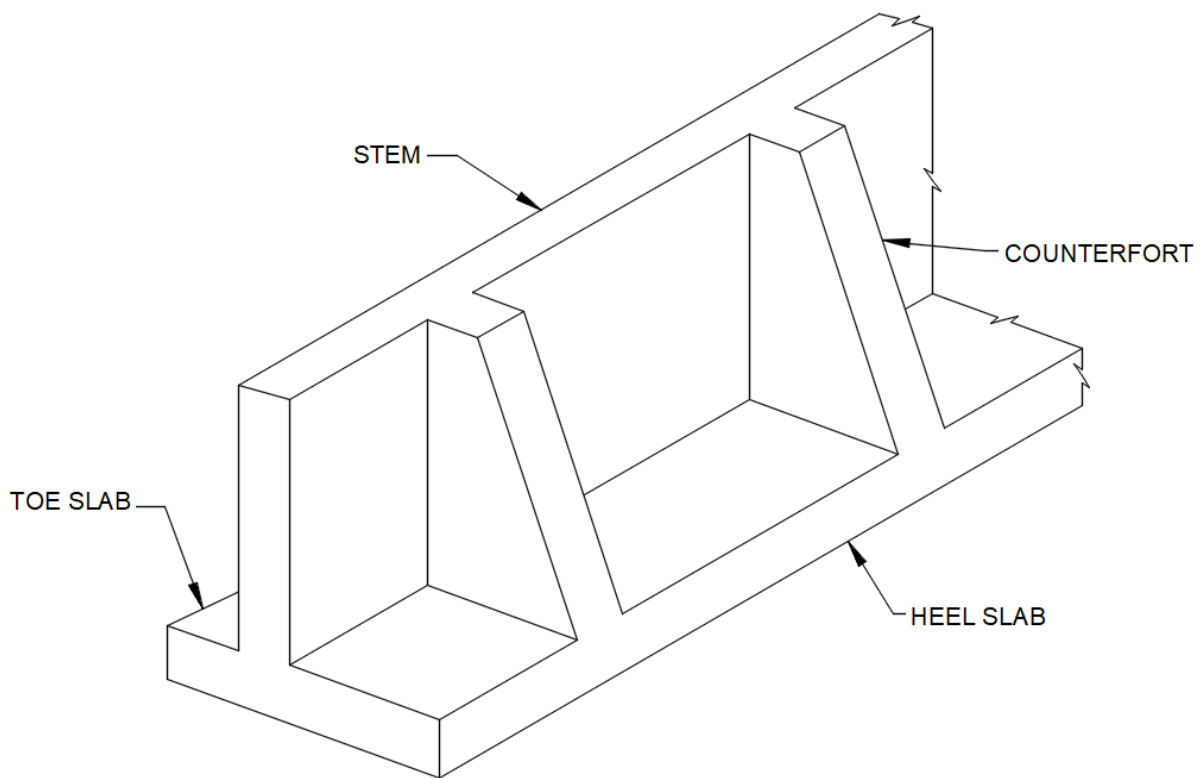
SCHEMATIC VIEW OF A COUNTERFORT RETAINING WALL
